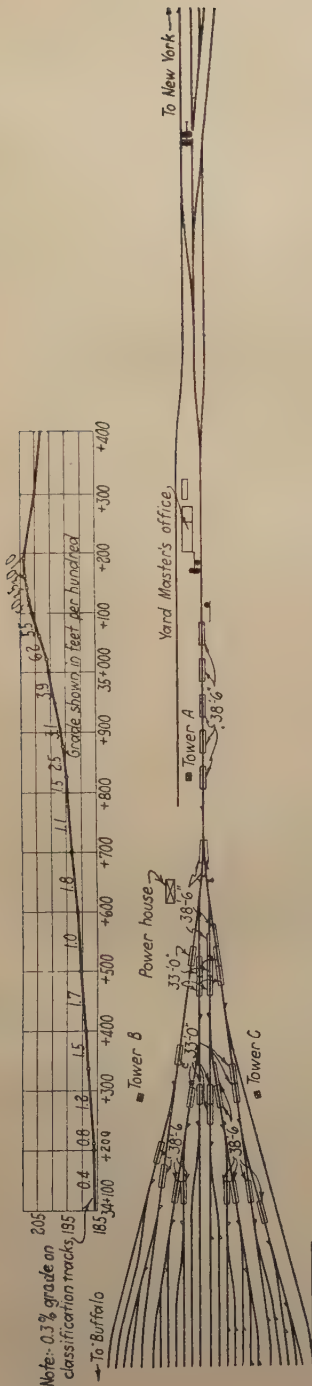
Track and signal plan showing track layout, grades and location of the retarders.
